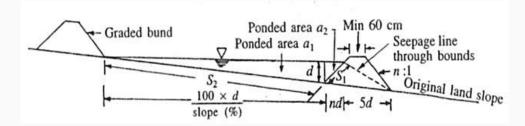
Design layout of graded bund. (Source: Das, 2002)
